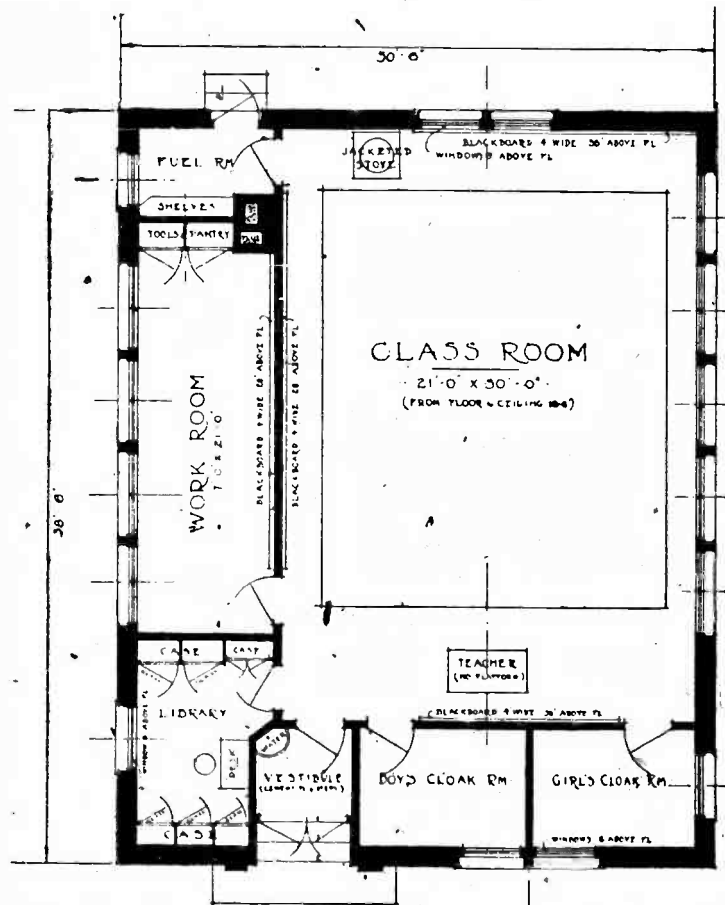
Floor plan of one-room school, Hobart & Cheney, Architects, San Francisco, Cal.
